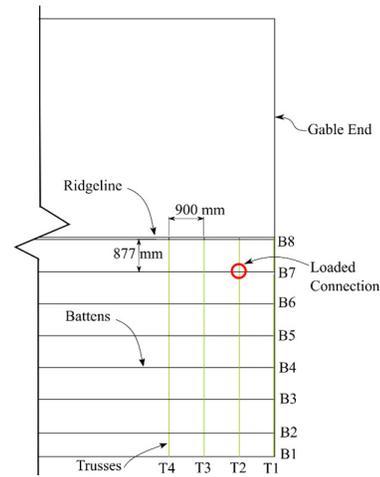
Plan view of batten to rafter/truss connections on the gable roof house modelled in the finite element model. [1]
